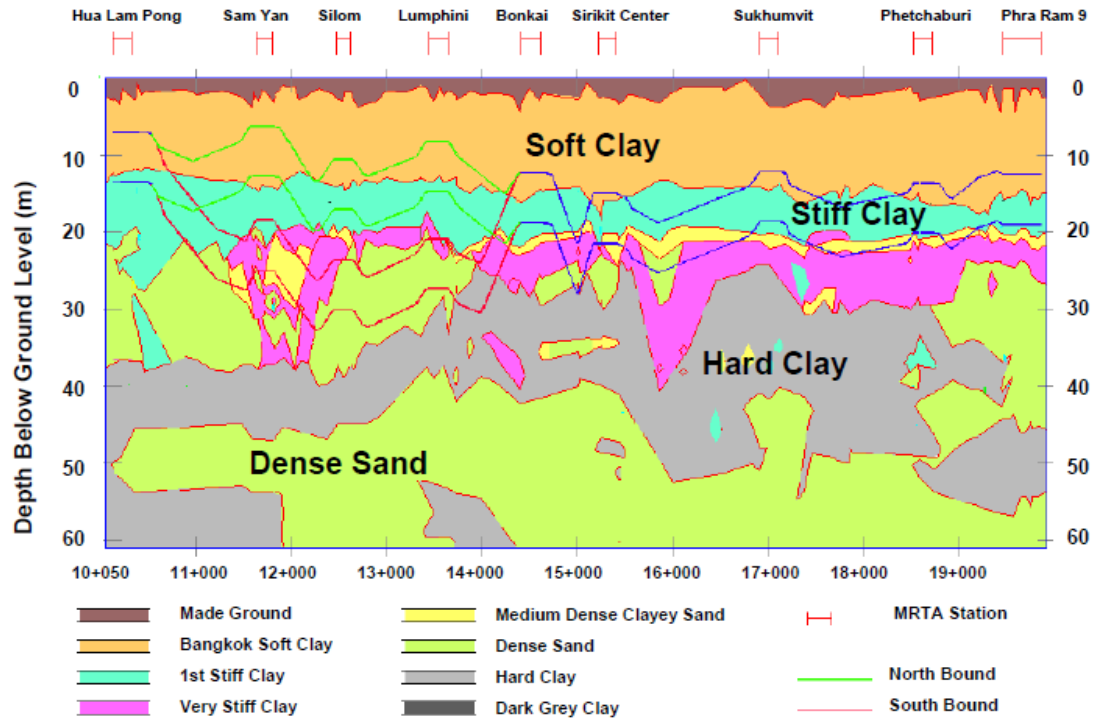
Soil Profile of Bangkok MRT Blue Line South Tunnel Section
